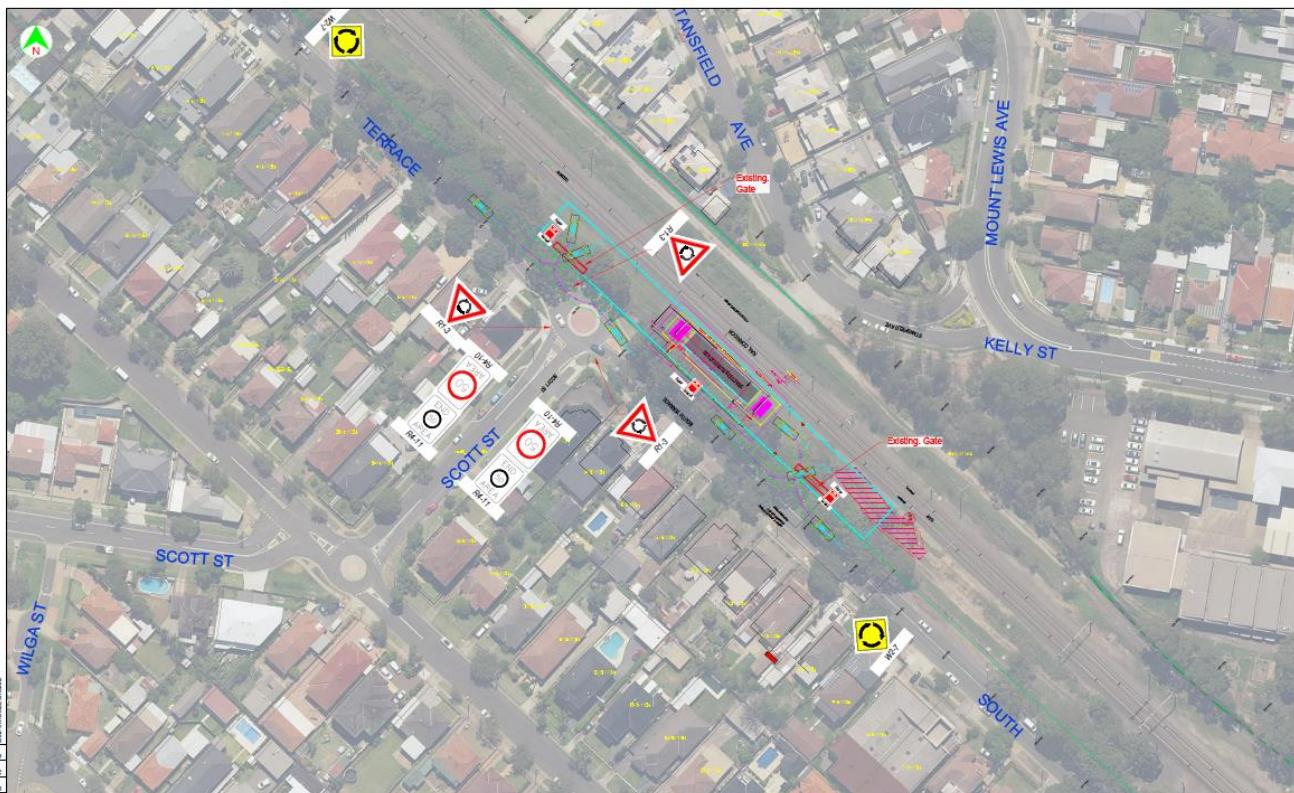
Punchbowl traction substation site plan (refer to Appendix A for details)
